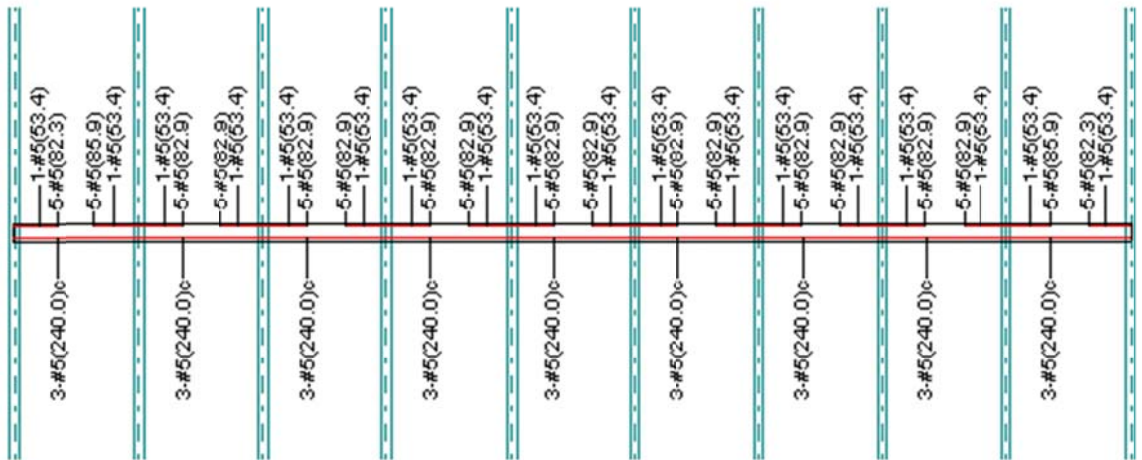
spSlab Column Line 8 Reinforcing Diagram
